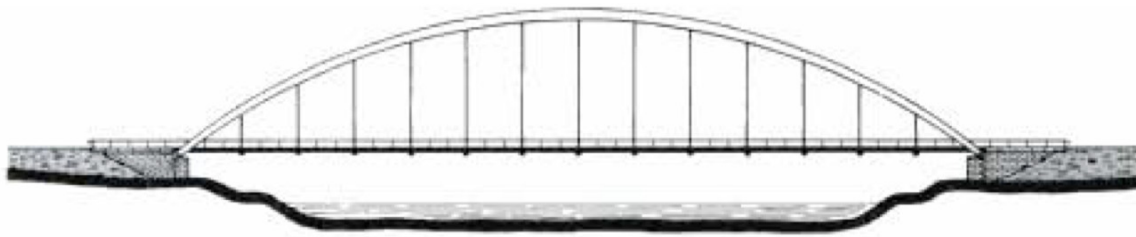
Stiffer arch and thin suspended deck [1]
